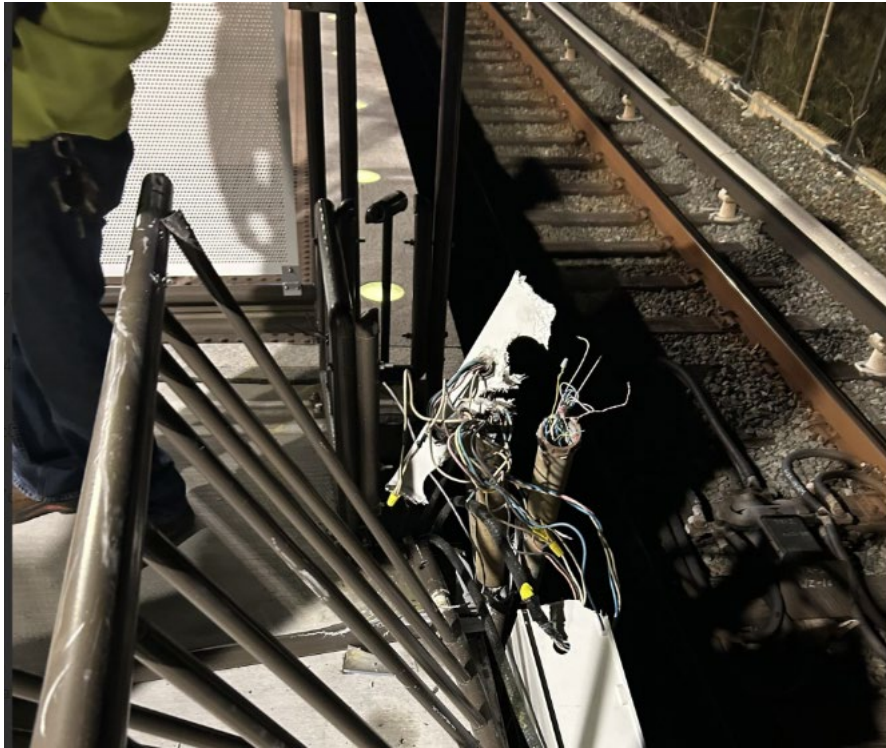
Depicts the location of the ETS Box and shows damage to the handrail.
